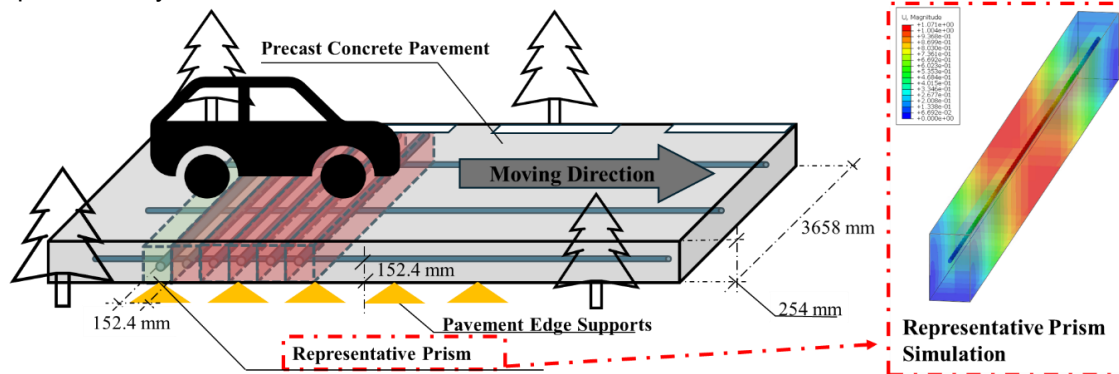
Schematic of a representative reinforced concrete prism for road pavement analysis.
